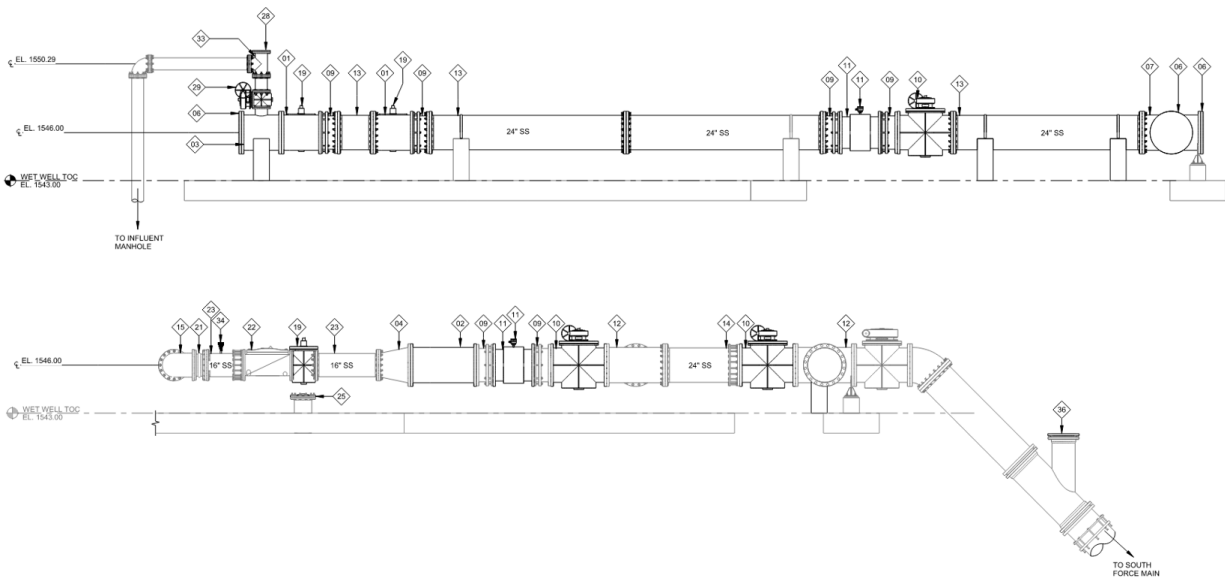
Proposed Lift Station 66 Improvements Sections
